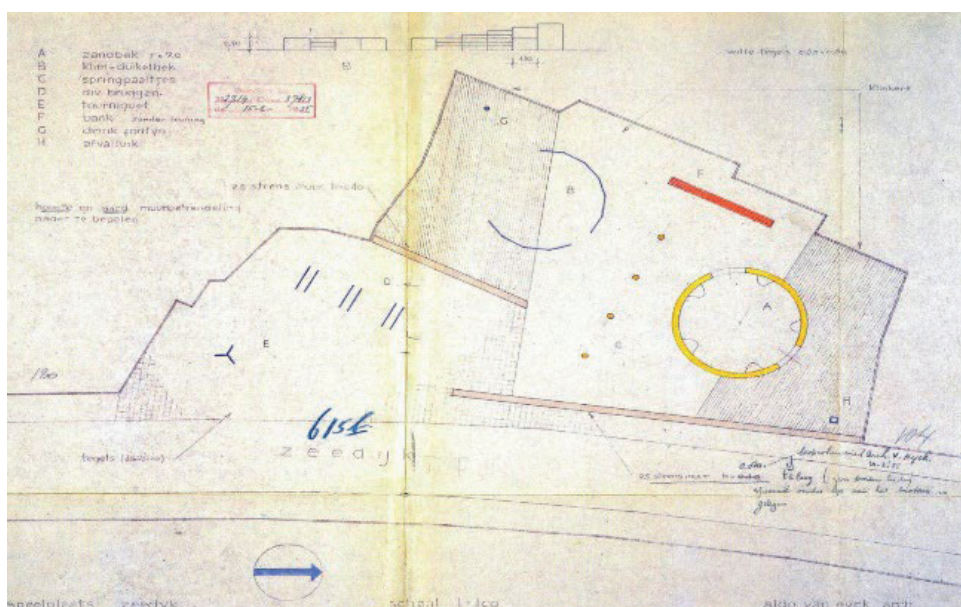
Playground, Zeedijk, Amsterdam, 1956.
